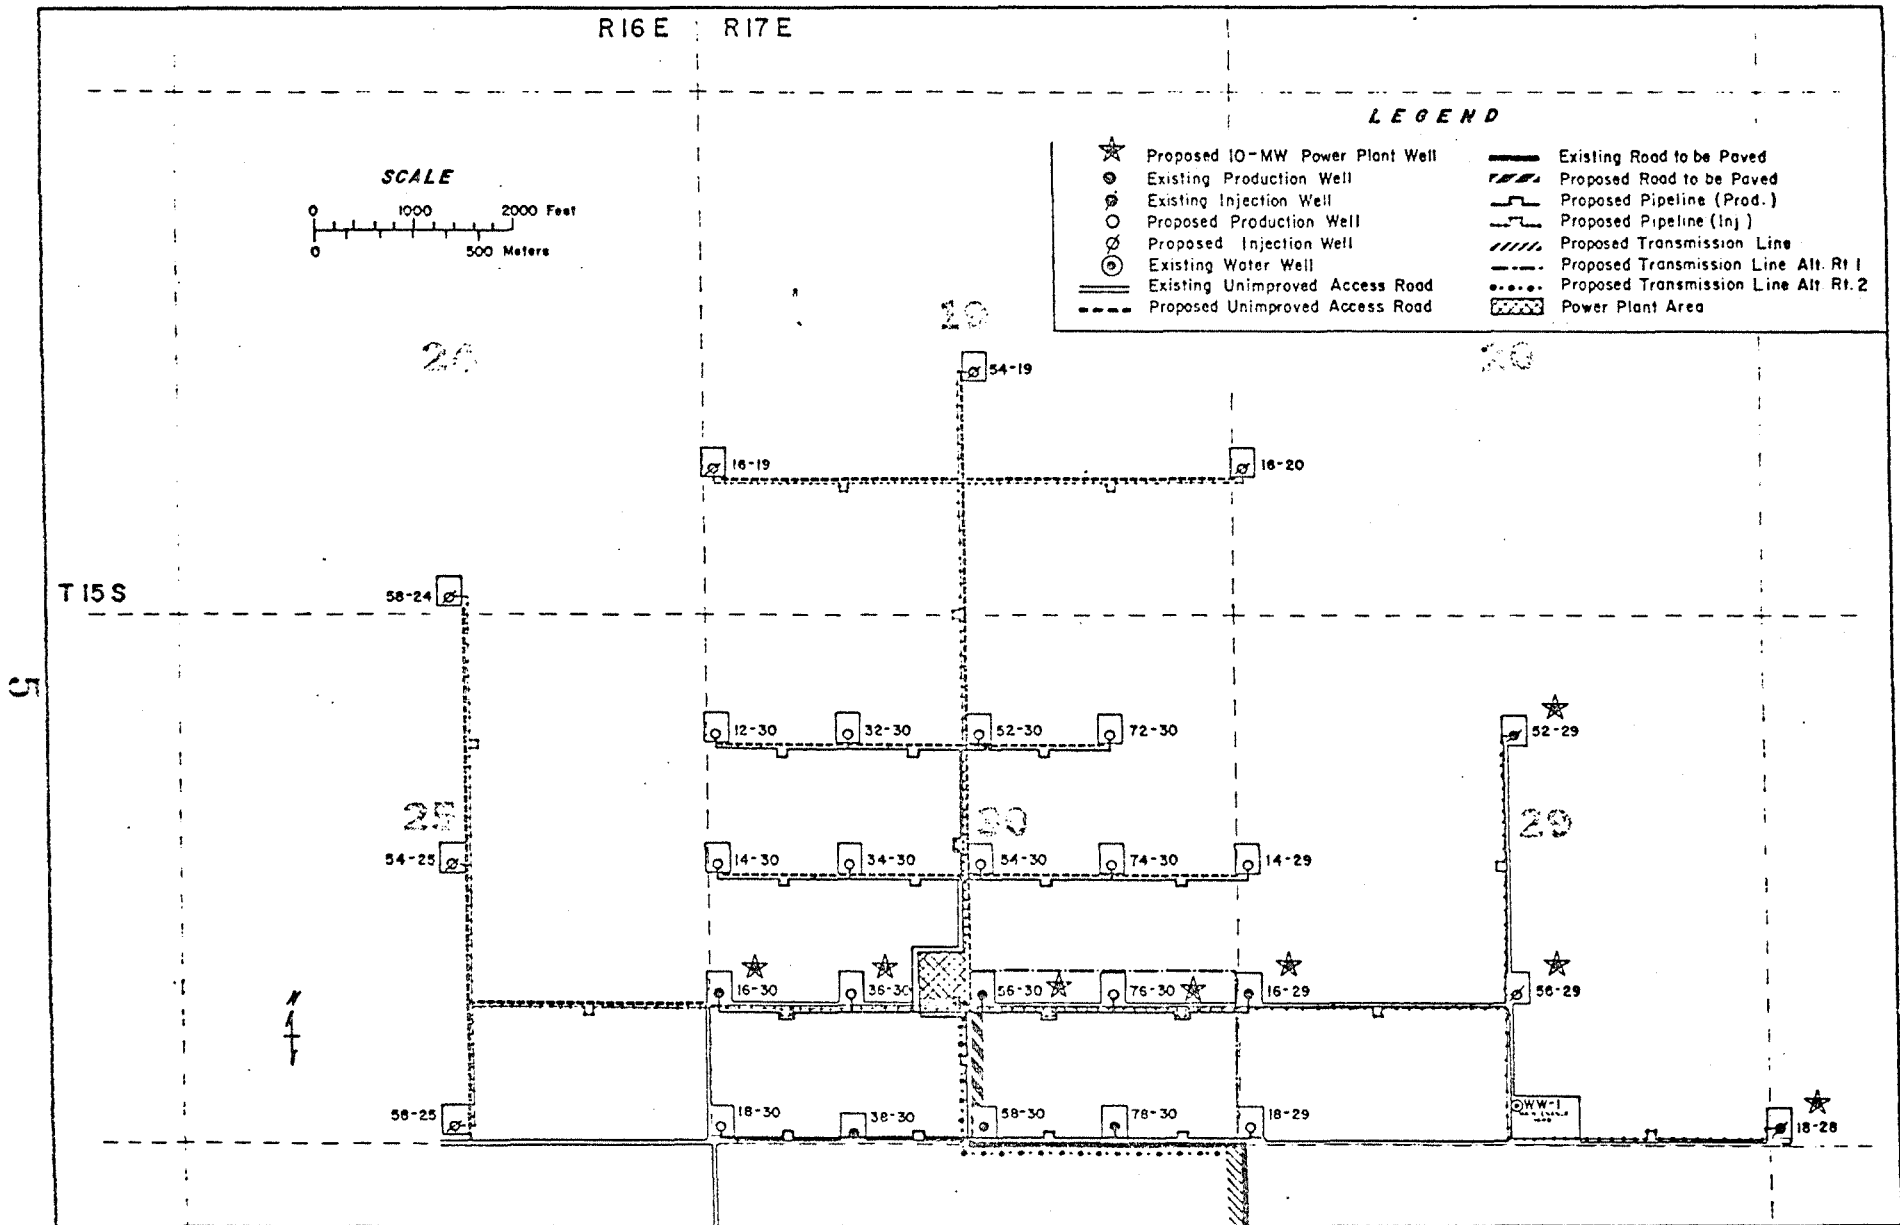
The conceptual field-development layout for Republic Geothermal, Inc.'s proposed 48-MW (net) power plant at East Mesa, California. This conceptual layout centers about alternative power plant site B, which RGI has chosen for the power plant. The production and injection pipelines, and production well-pump power lines would run adjacent to the roads. The eight wells that are to be used for RGI's 10-MW research and demonstration power plant are designated by stars (from Republic Geothermal, Inc.'s Plan of Development in Appendix A-1).
